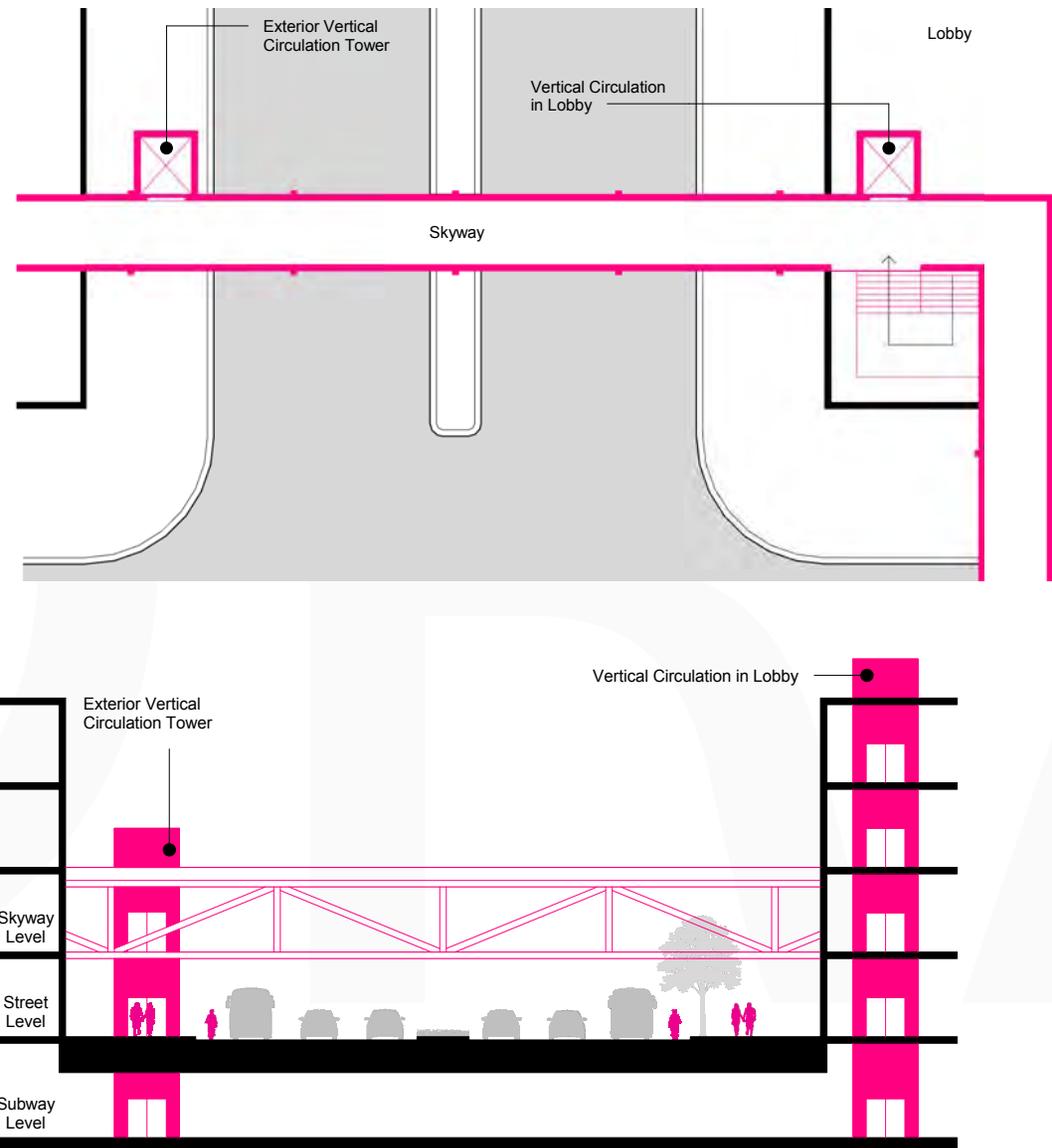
Plan and section of visible connection between levels in exterior tower and building lobby
